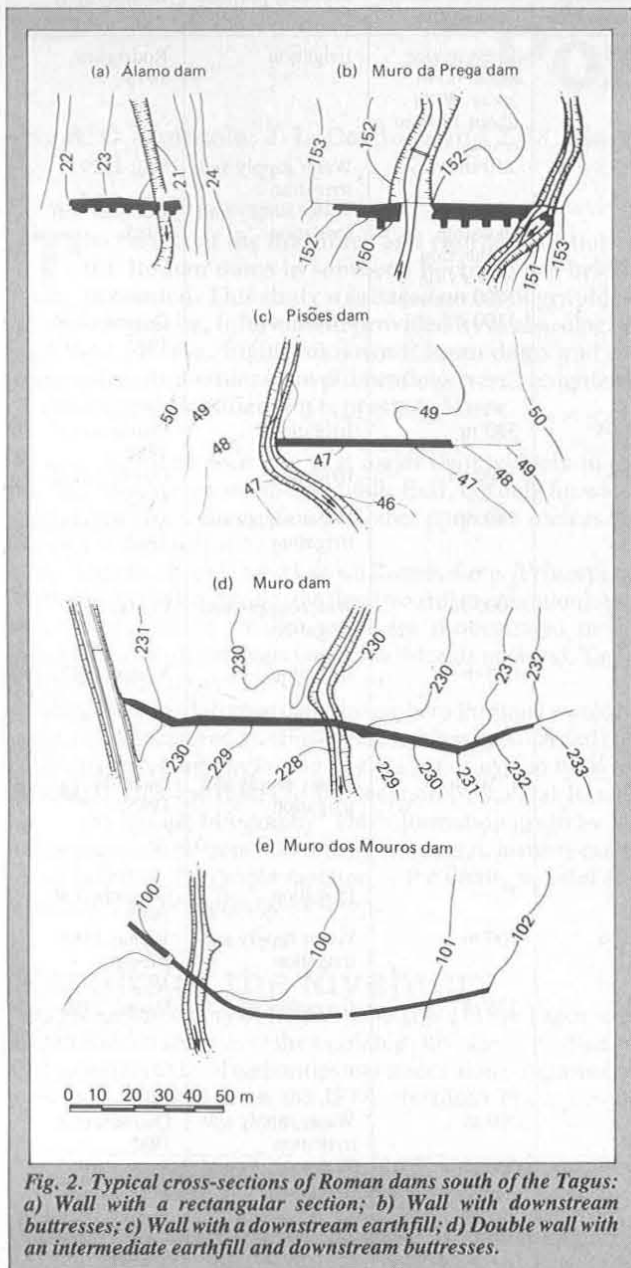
Typical cross-sections of Roman dams south of the Tagus: a) Wall with a rectangular section; b) Wall with downstream buttresses; c) Wall with a downstream earthfill; d) Double wall with an intermediate earthfill and downstream buttresses.
